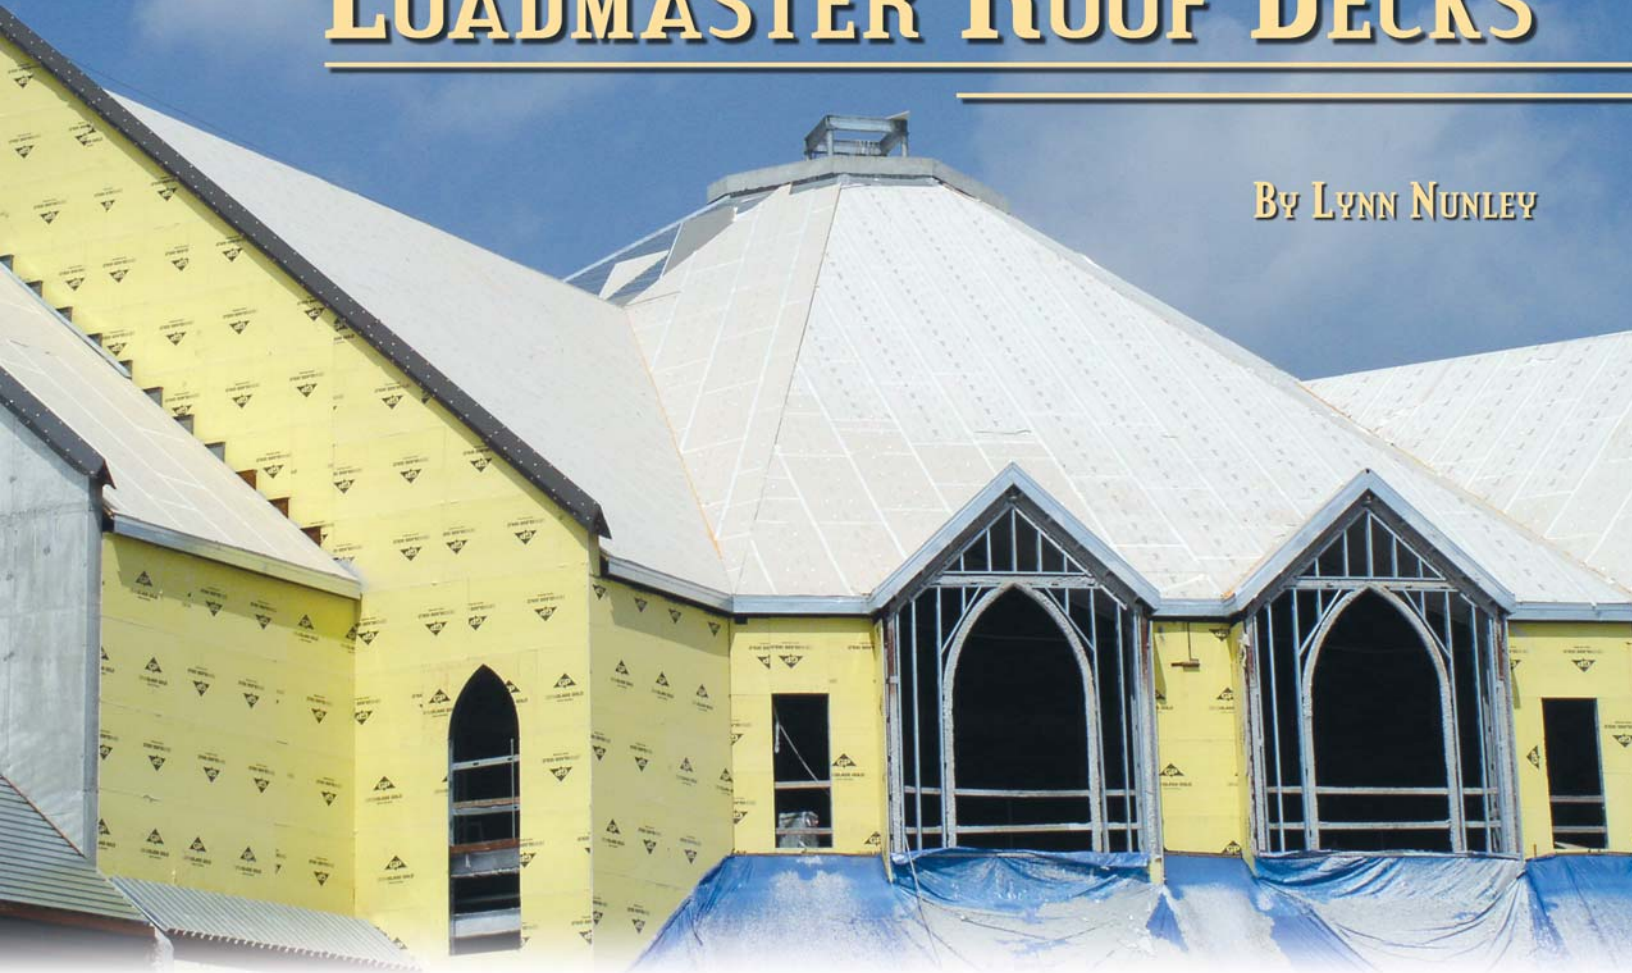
Loadmaster steep-slope assembly with shingle application on a church facility.
